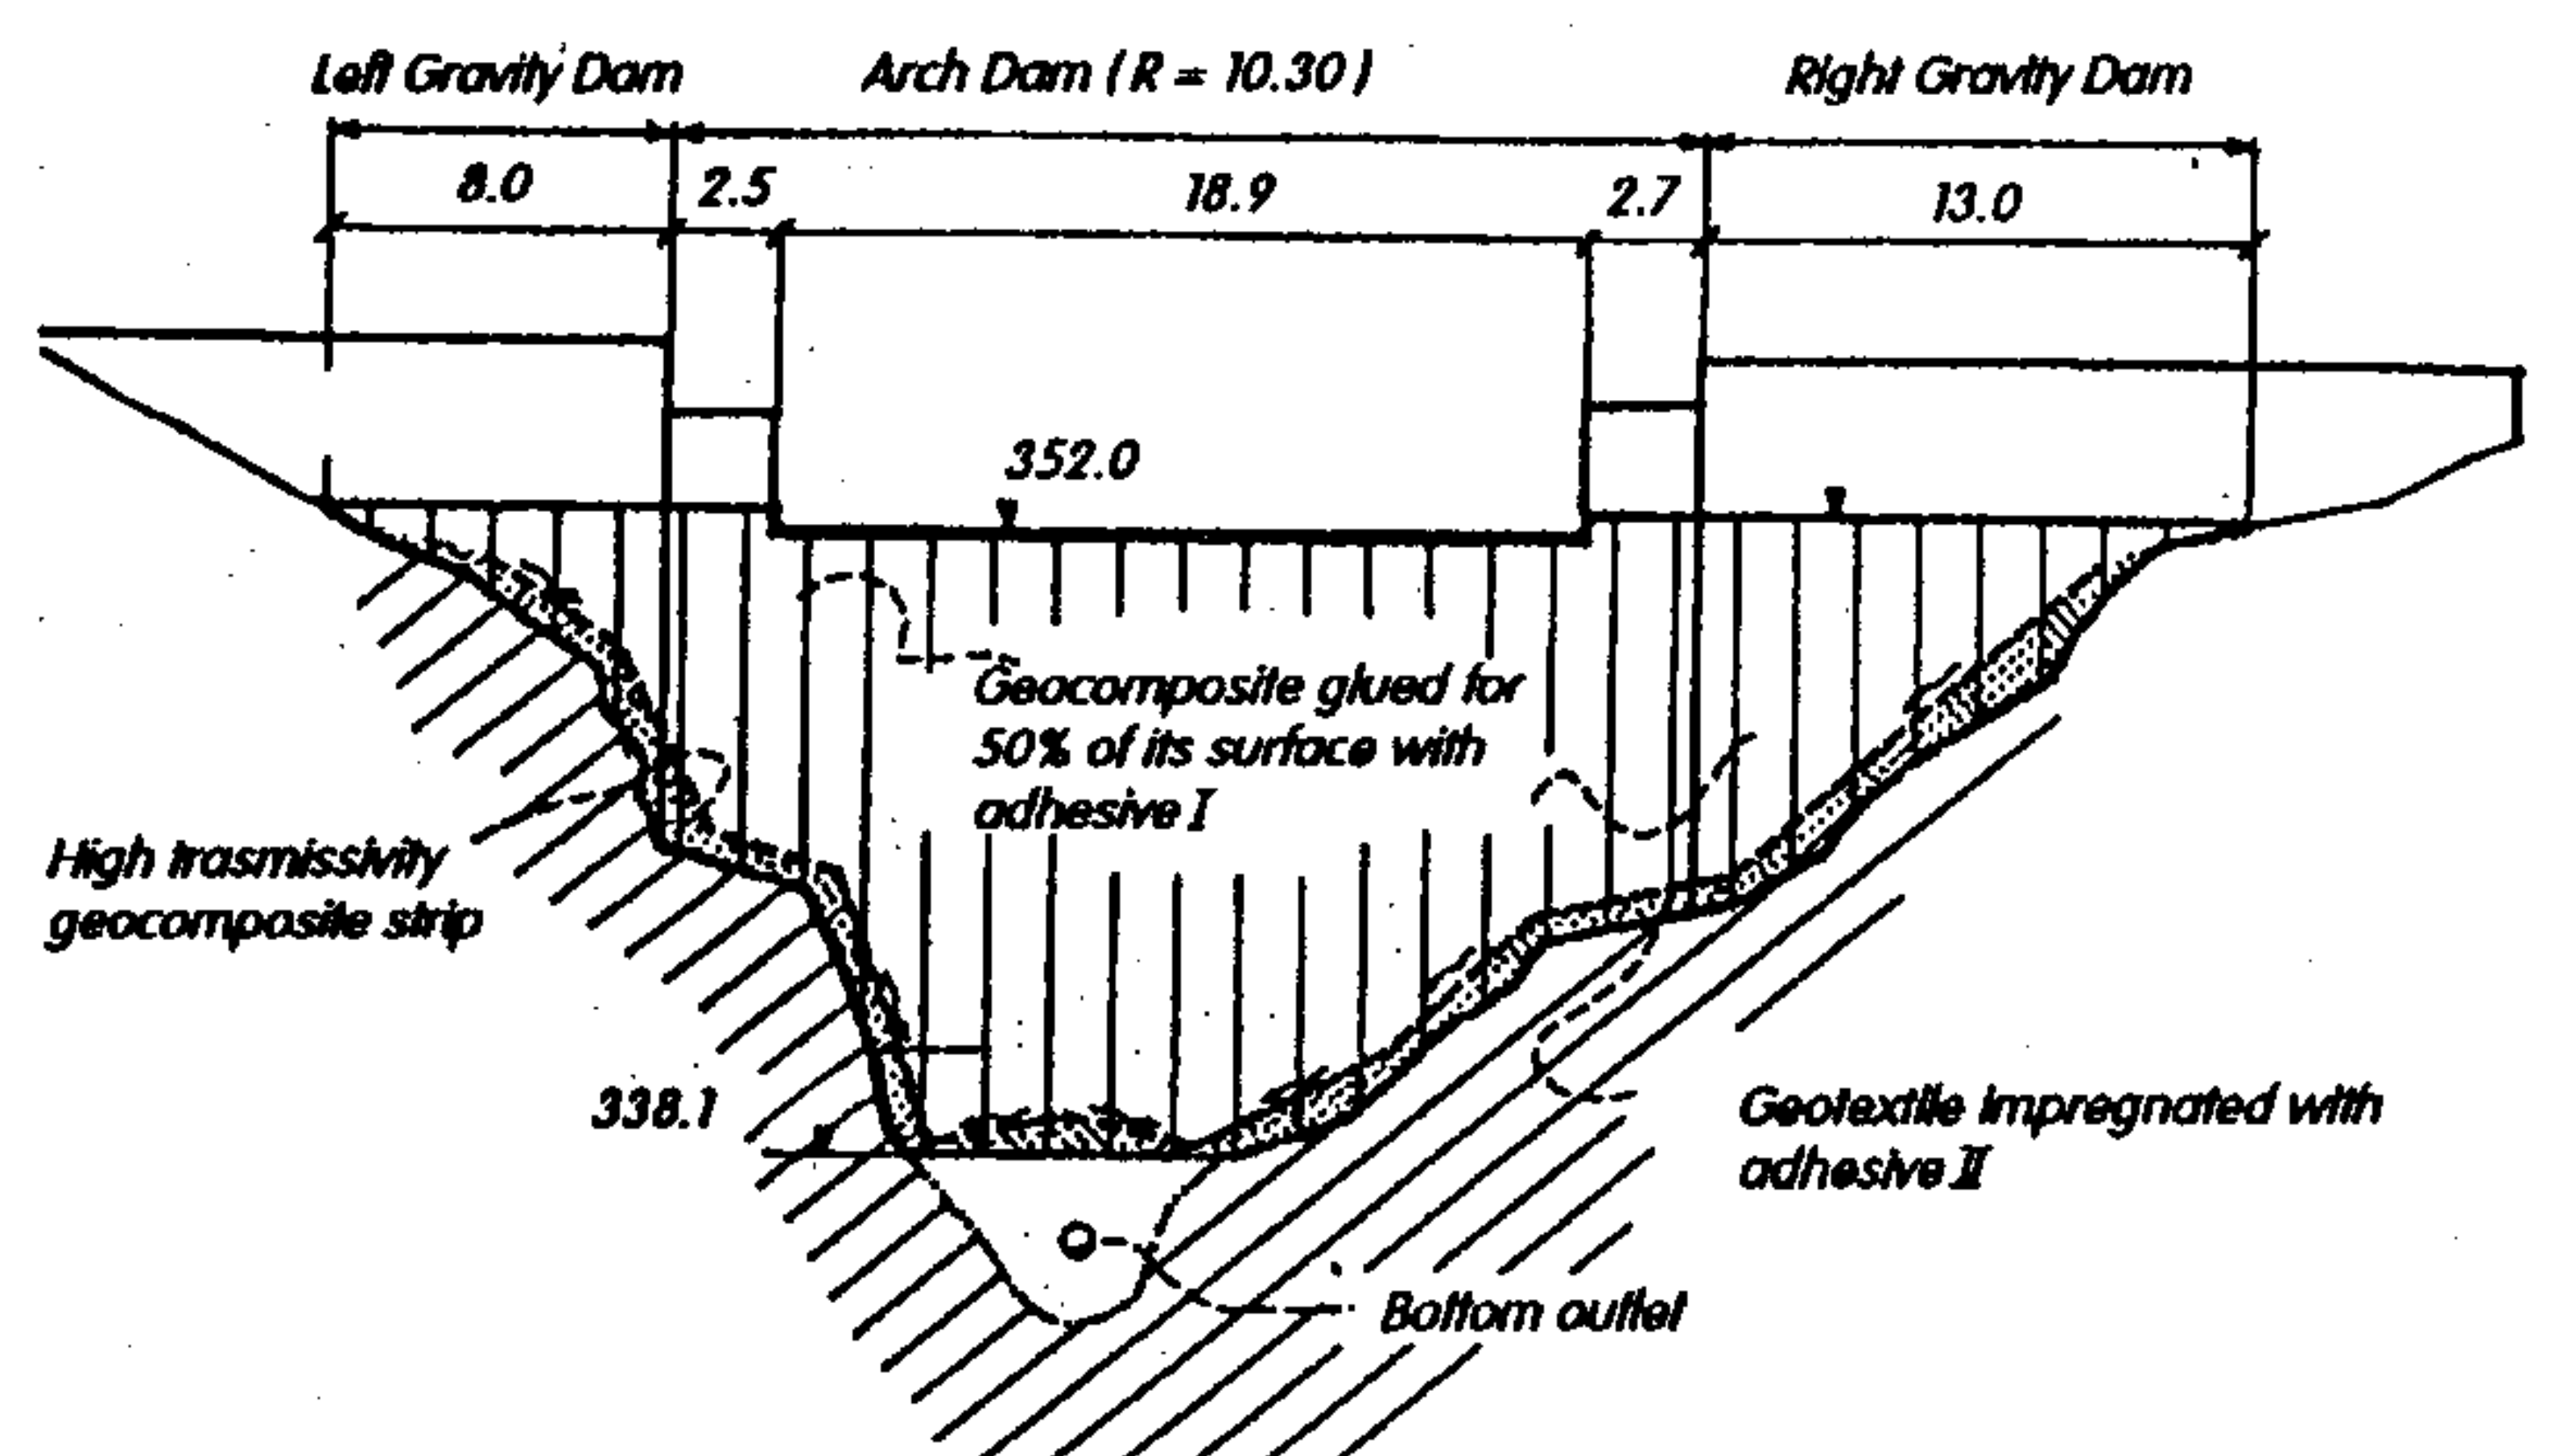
Zolezzi dam renovation: plan of the geosynthetics application.
